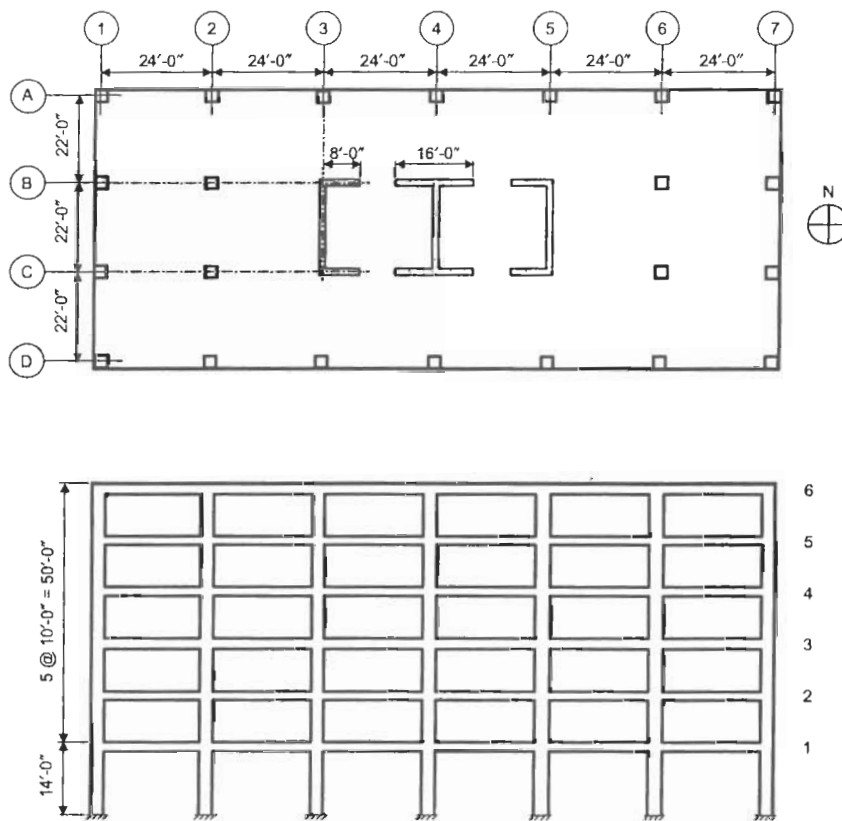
Typical Plan and Elevation of Example Building (SDC C)
